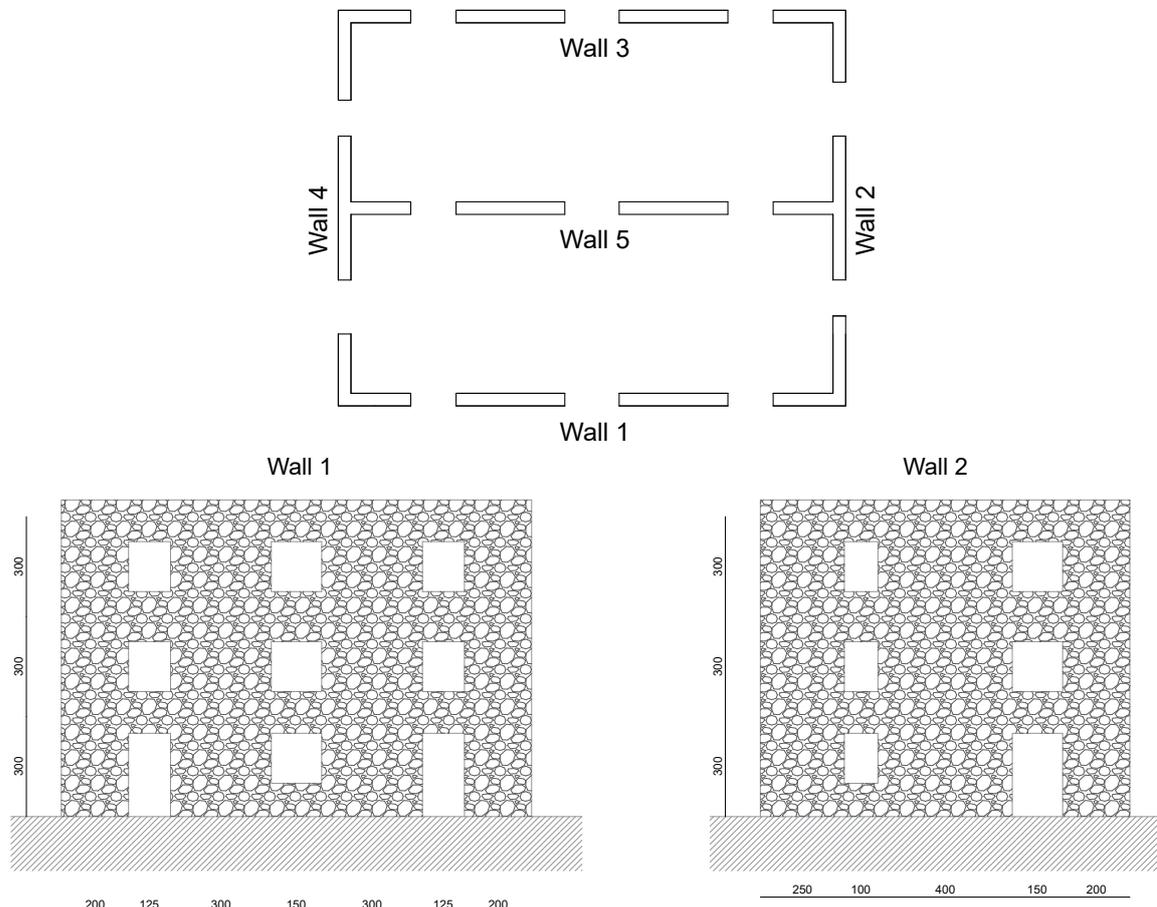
Geometry of the building and the two reference walls (longitudinal and transverse)
